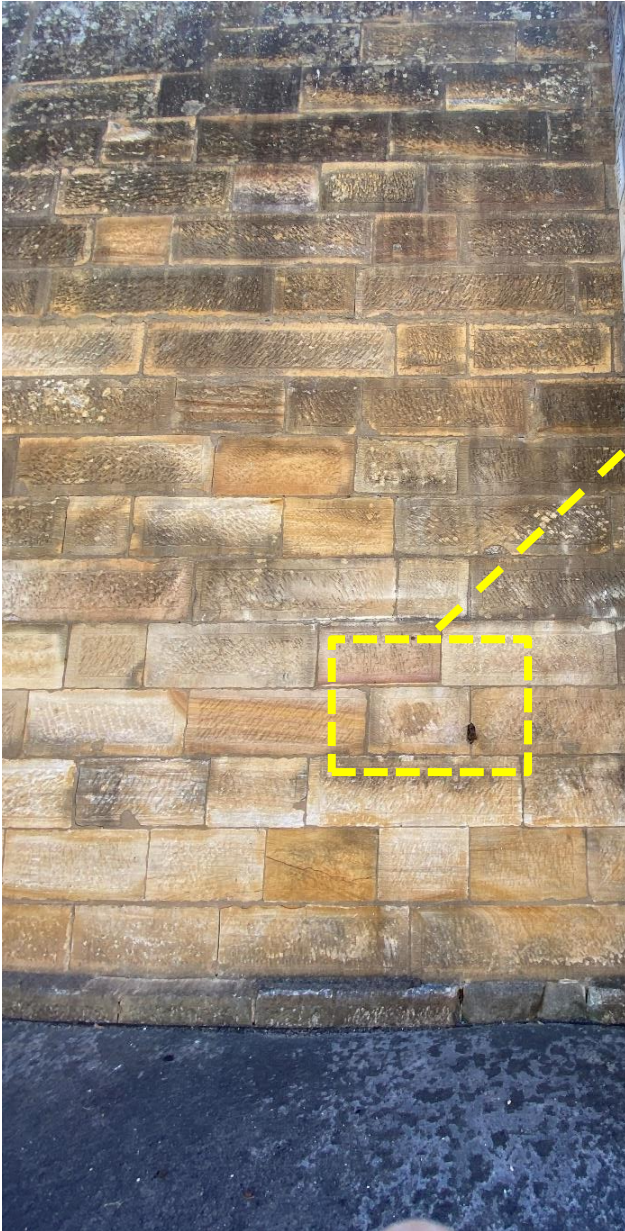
View of western wall (adjacent to buttress) showing location of crosses / markings in stone.
